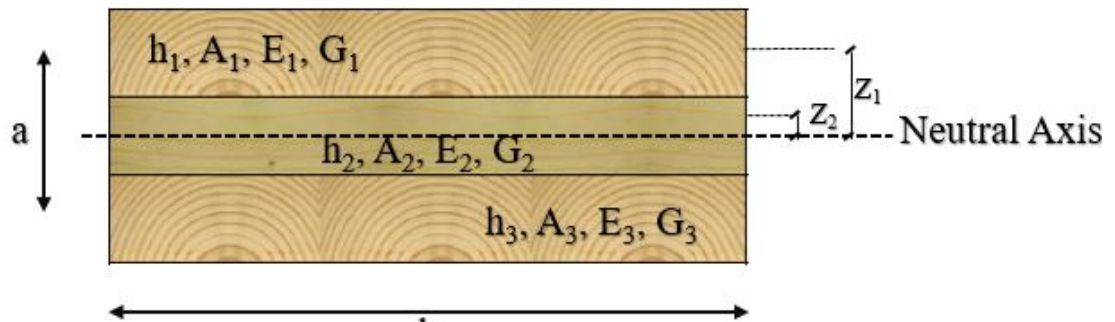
Cross Section of Three-Layers Short-Span Specimen
